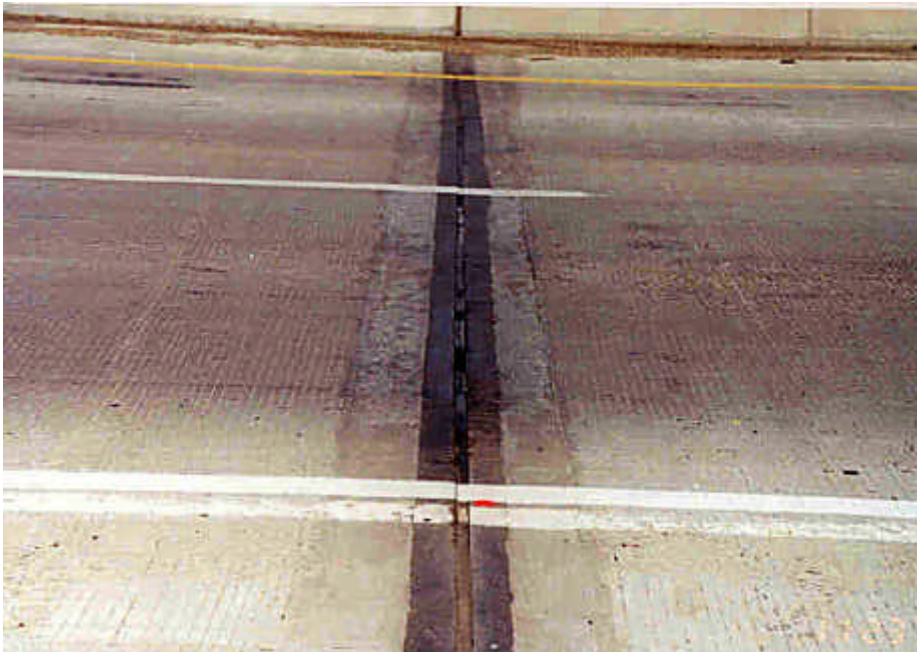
Seal failure - EB adhesion loss and punched down 1999.
